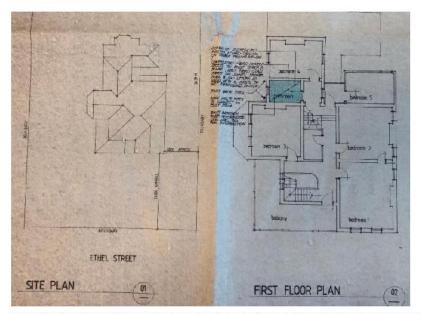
Extract from architectural plans associated with BA 249-90 drawn by Hedley, Carr, Allan and Watts Achitects showing the proposed works to the first floor bathroom and the then existing site plan (Source: Burwood Council archives).
